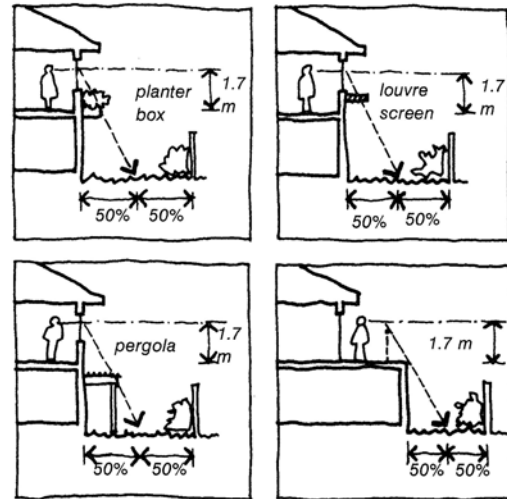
Techniques for providing privacy to a lower dwelling's private open space.
